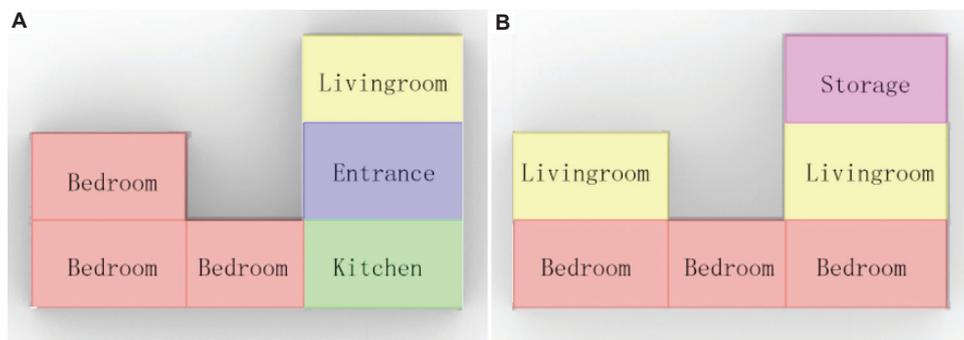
The plan of the sample building: (A) ground floor, and (B) first floor
